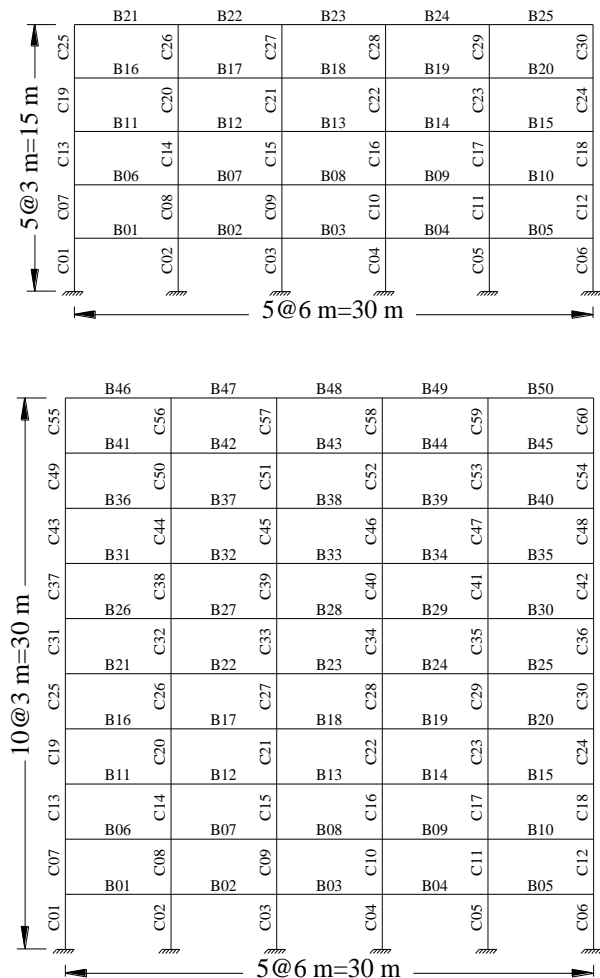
Finite element models for 5-bay moment-resisting steel frames with 5 and 10 floors.
